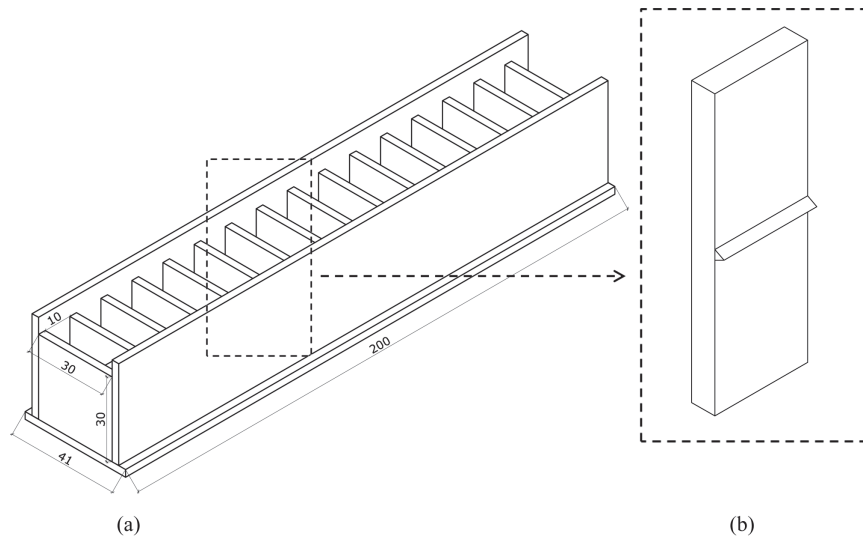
Formwork for concrete plates (a) scheme, (b) detail
